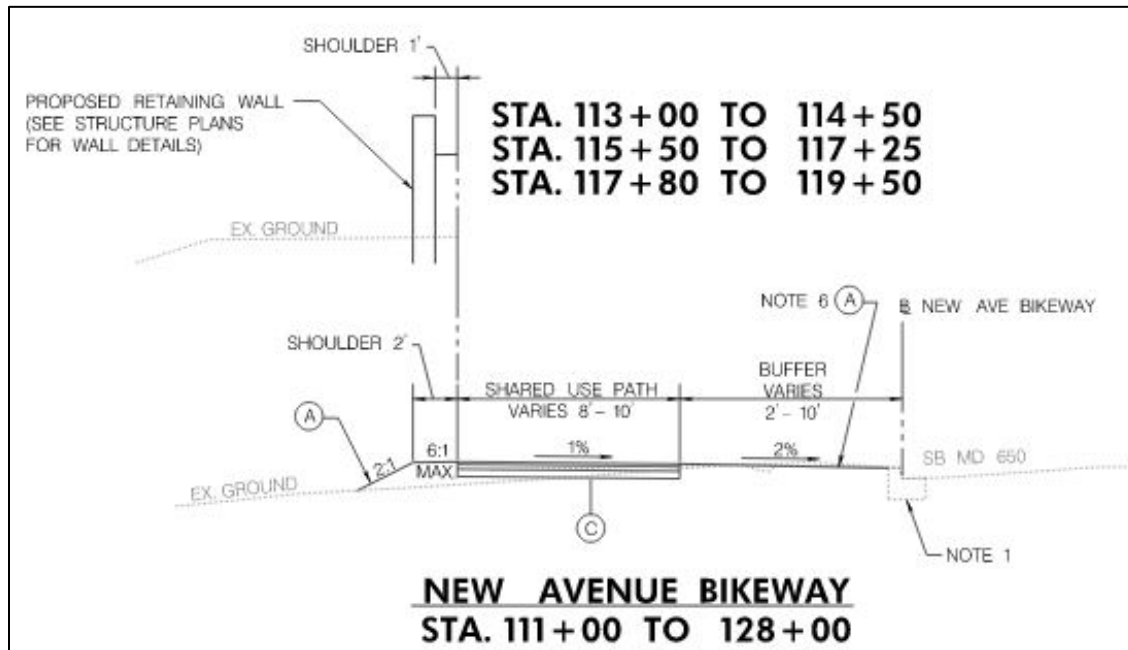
Sidepath Between Sligo Creek Parkway and Larch Avenue – Proposed Cross Section
